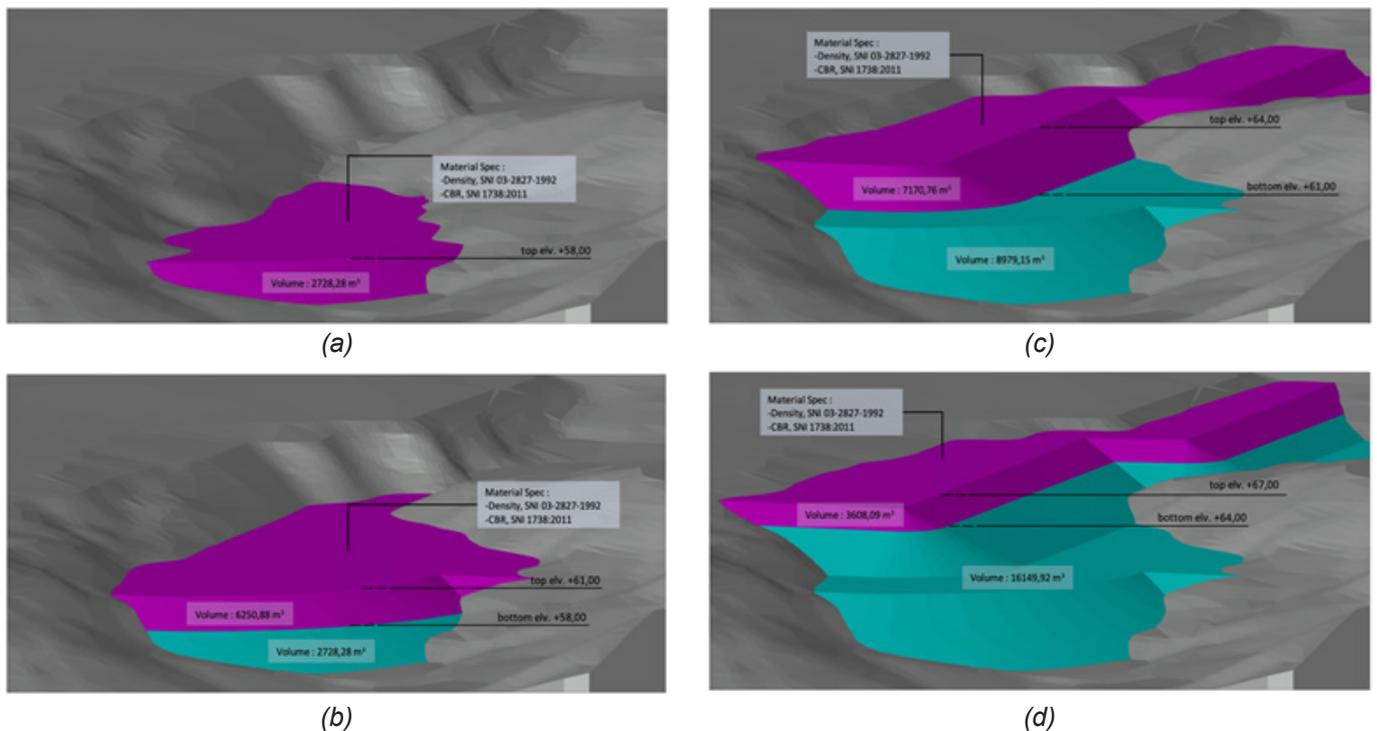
3D visualization for each elevation of embankment (a) Embankment until elv. +58,00 (b) Embankment until elv. +61,00 (c) Embankment until elv. +64,00 (d) Embankment until elv. +67,00
